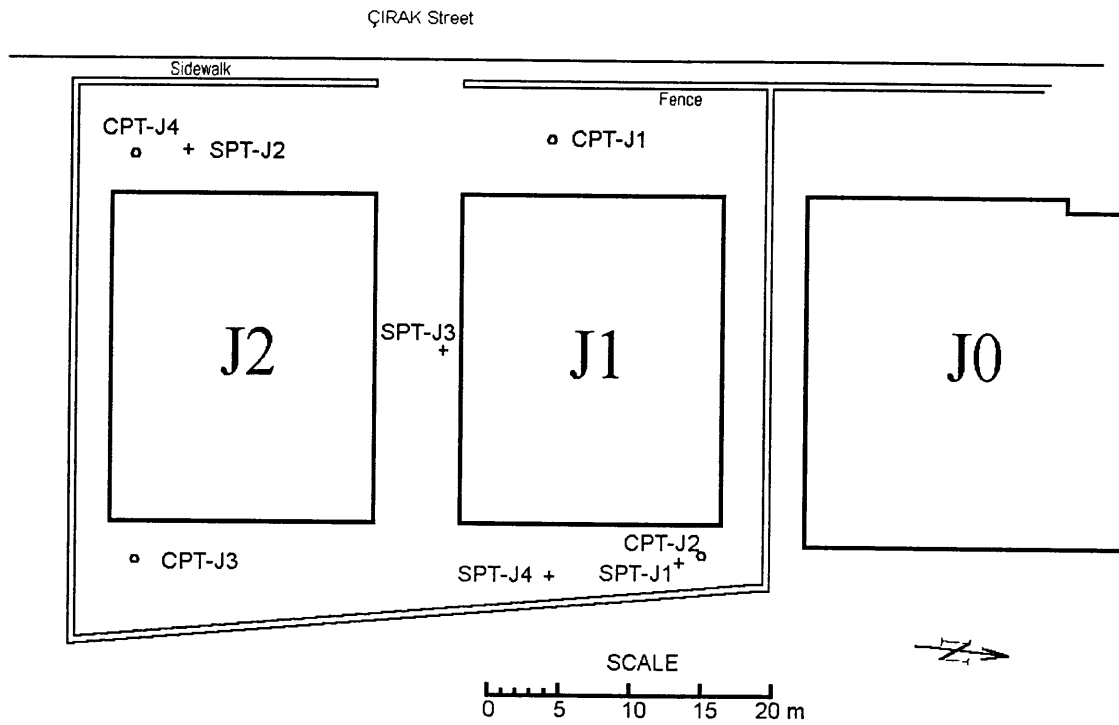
Plan view of Site J and location of subsurface exploration points
